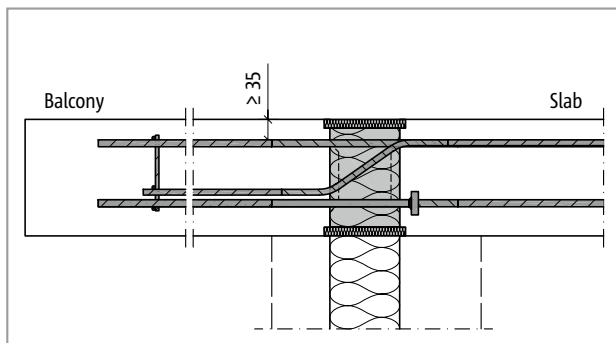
Schöck Isokorb® XT type C-CV35: Connection with non-load-bearing cavity wall masonry
